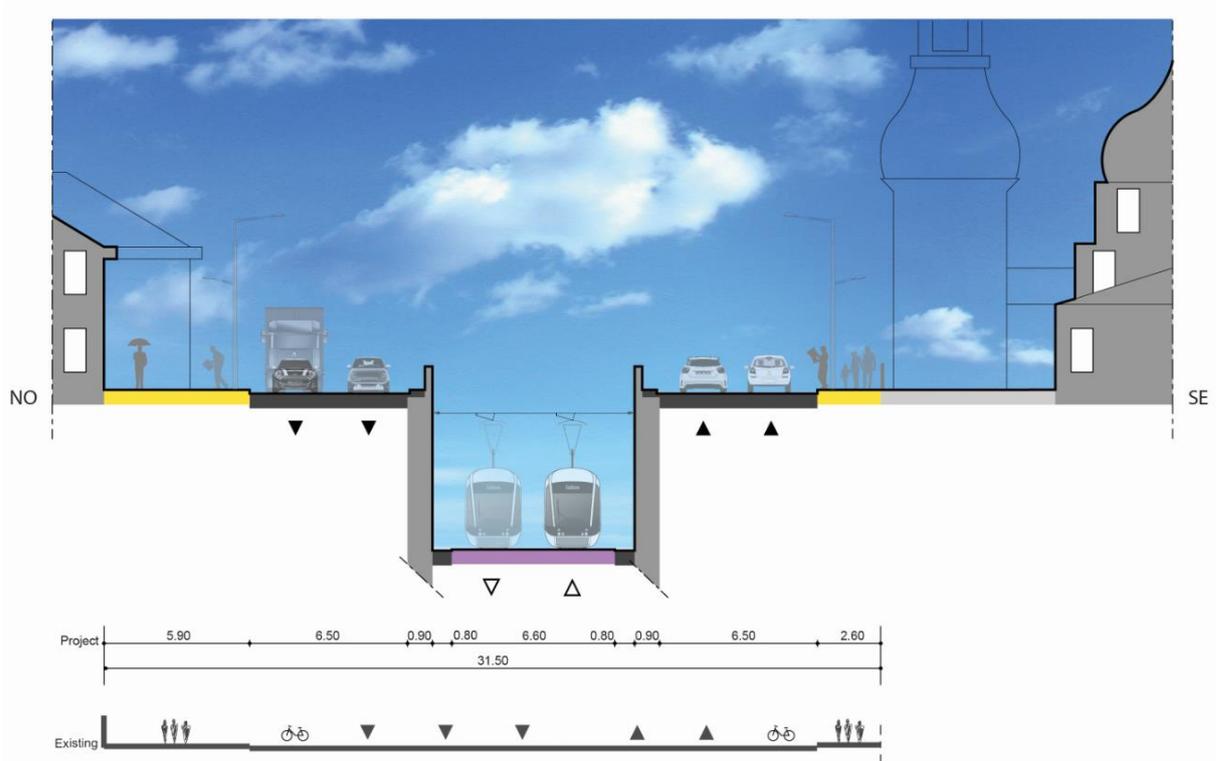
Tramway in tunnel option - section on the ramp in Liivalaia Street - Egis
